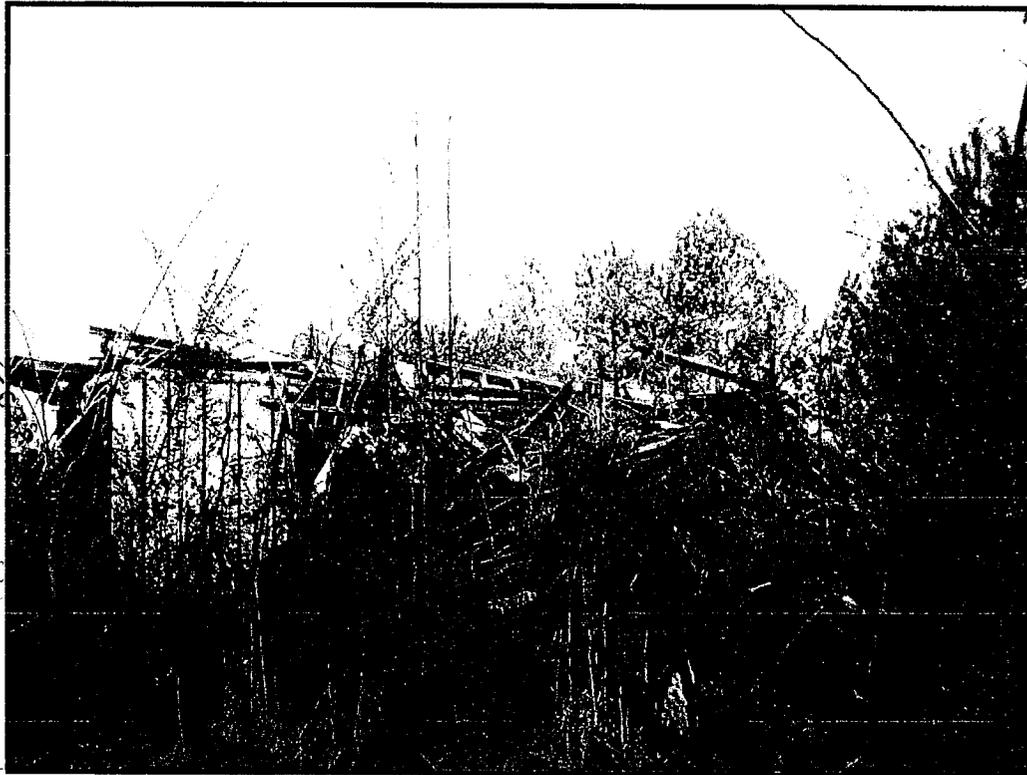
View of collapsed structure likely used as an office for abandoned plywood plant, facing north.
